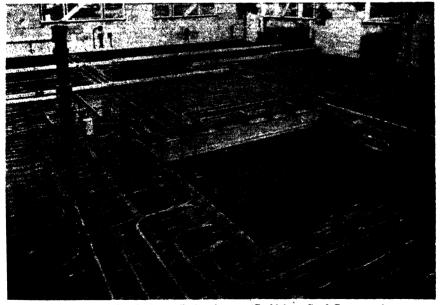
Steel-pipe coils in place. (Bethlehem Steel Company.)
